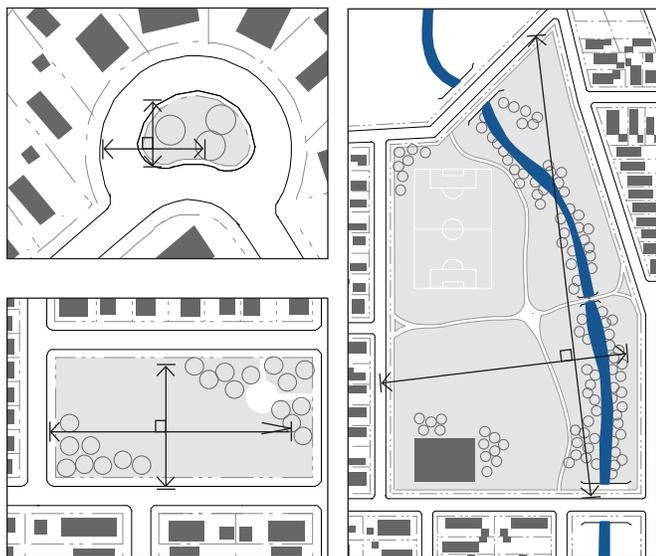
(1). Examples of Measuring the Minimum Dimension of Open Space Types.
